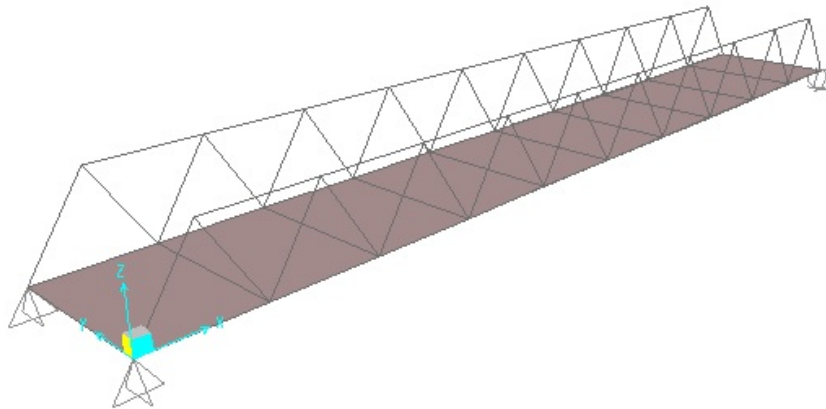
Isometric view of the PEI-GF truss bridge
